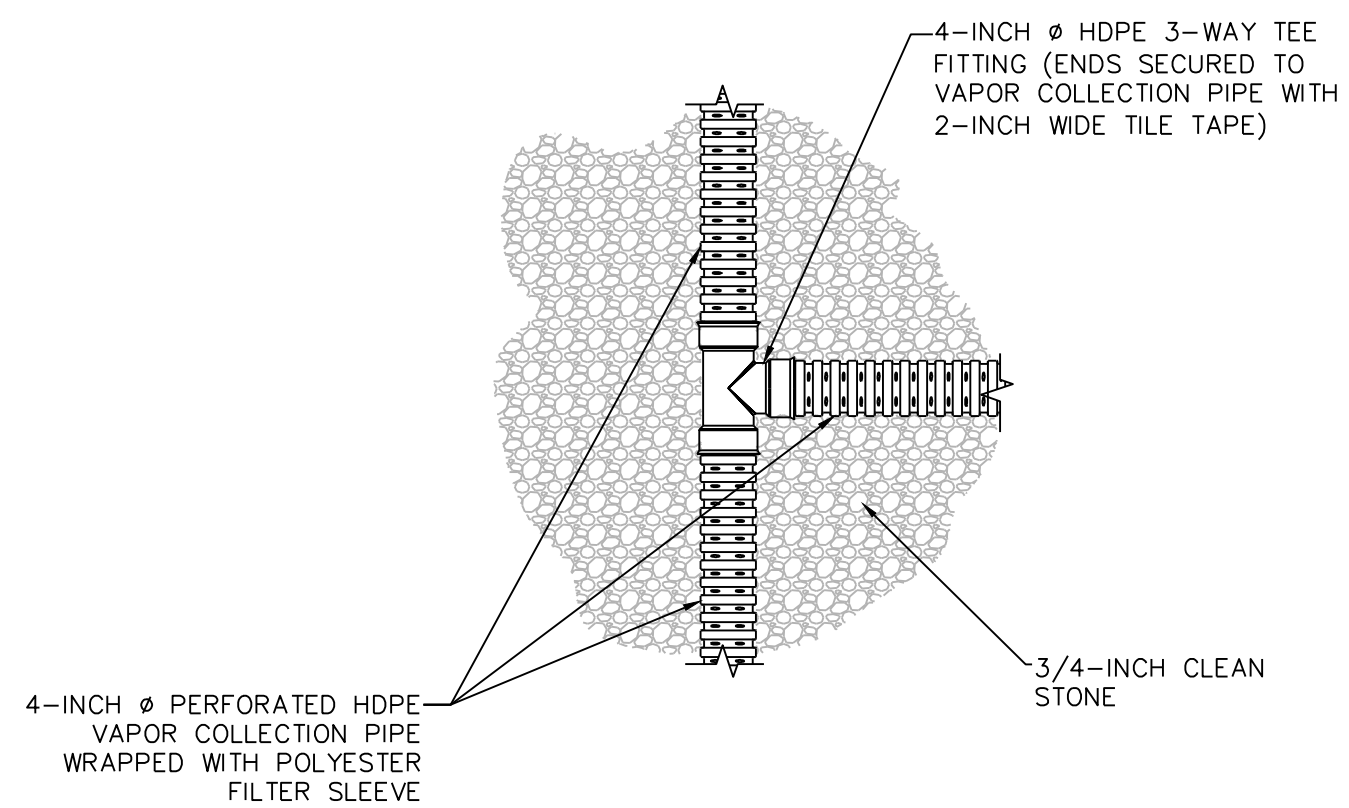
TYPICAL SECTION THROUGH SUB-SLAB
